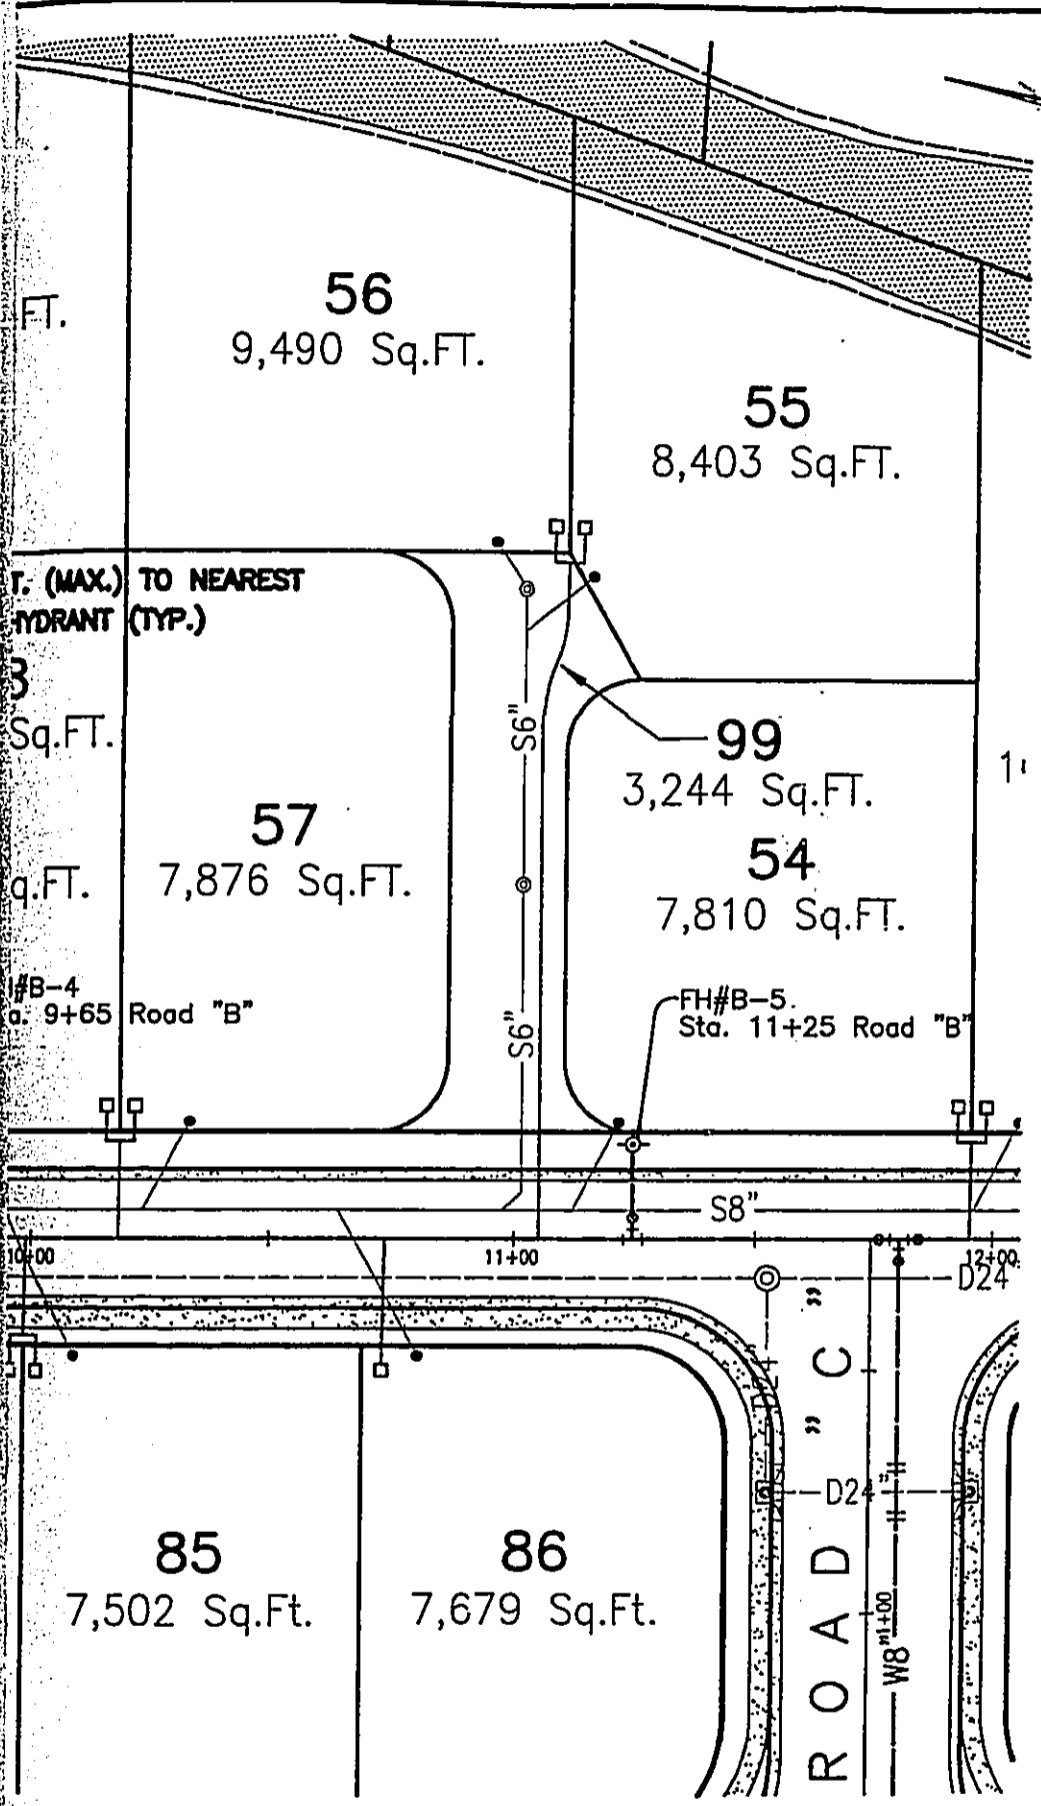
EXHIBIT - ROAD "B" FIRE HYDRANT LOCATIONS
